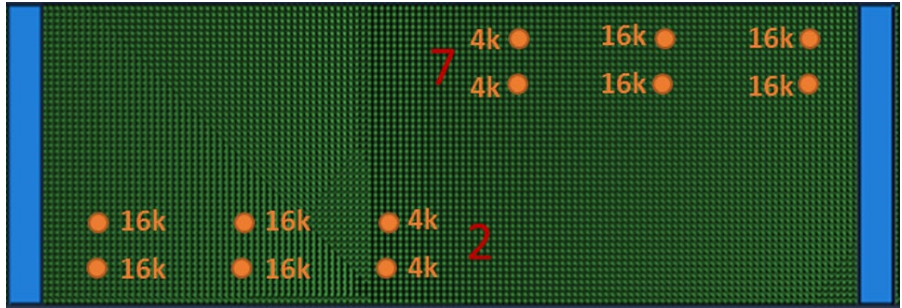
Live load applied at Box Girder 2 (Location 2 and 7)
